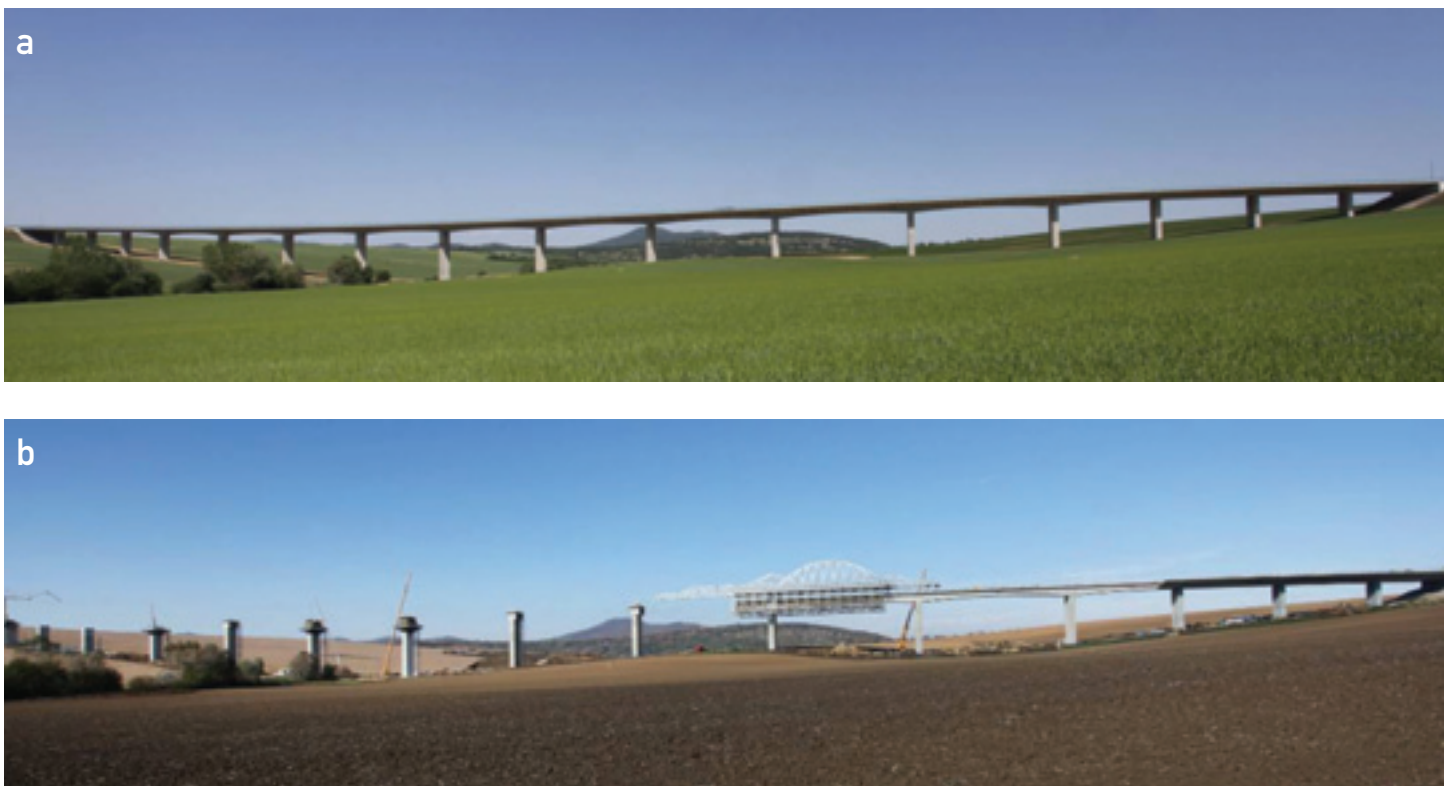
Bridge across the Hostovsky Creek Valley: (a) completed bridge, (b) span-by-span erection
